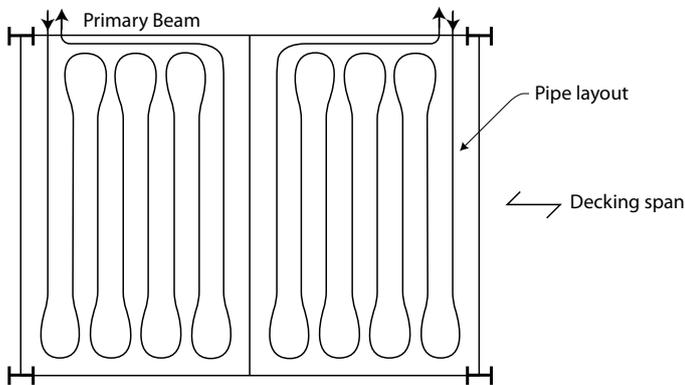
Typical plan view of individual heating pipe circuit for a floor
